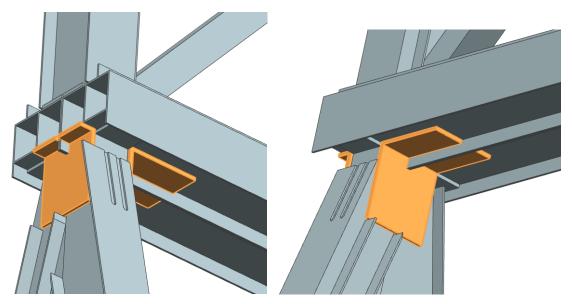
Leg Inner and Outer Side Brackets: Connection of a side Leg set to the Bottom Beams
